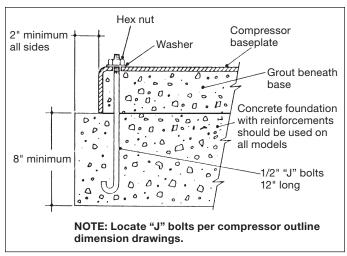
A: Recommended foundation details for Corken compressors 91–691.
